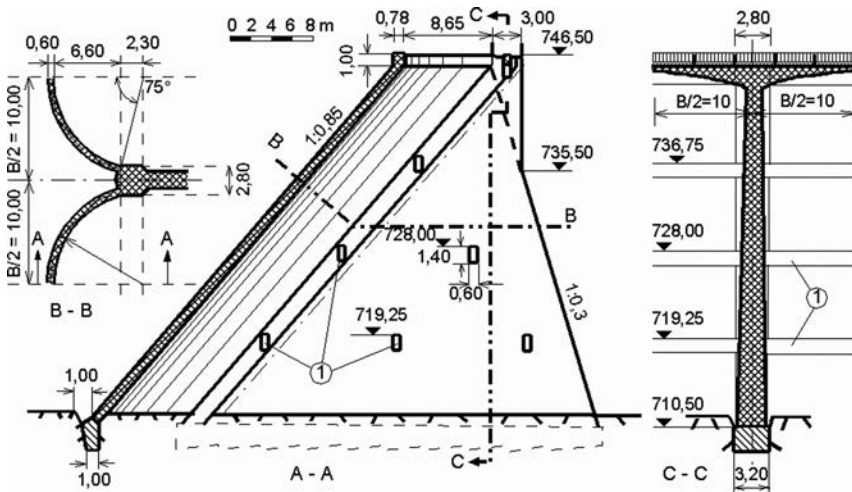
Cross-section (A-A) and details of Prilep buttress dam. (1) Longitudinal stiffening beams.
